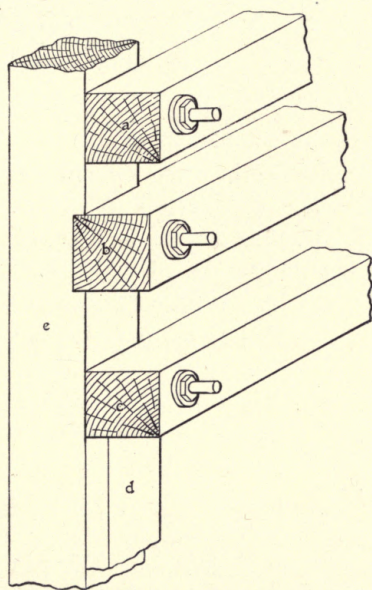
BEARING POWER OF SIDE-WOOD ON BOLTS AND "DAPS."
